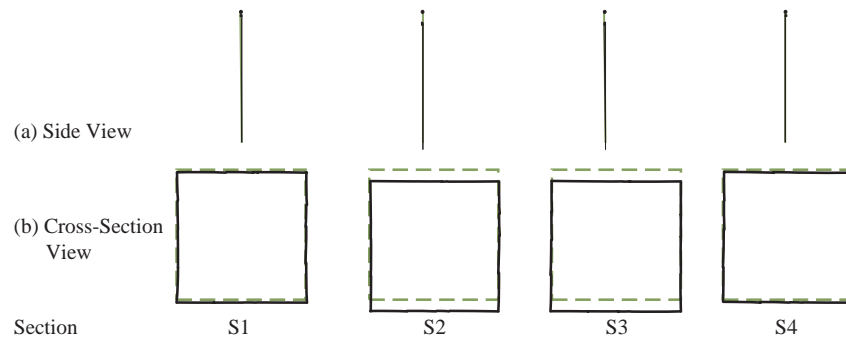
Deformed cross-sections in the straight skewed box girder.
